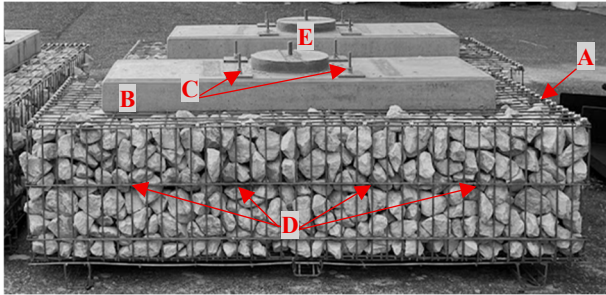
Ledrosteel Foundation. A=gabion, B=PLCE, C=anchor, D=tie, E=hinge.
